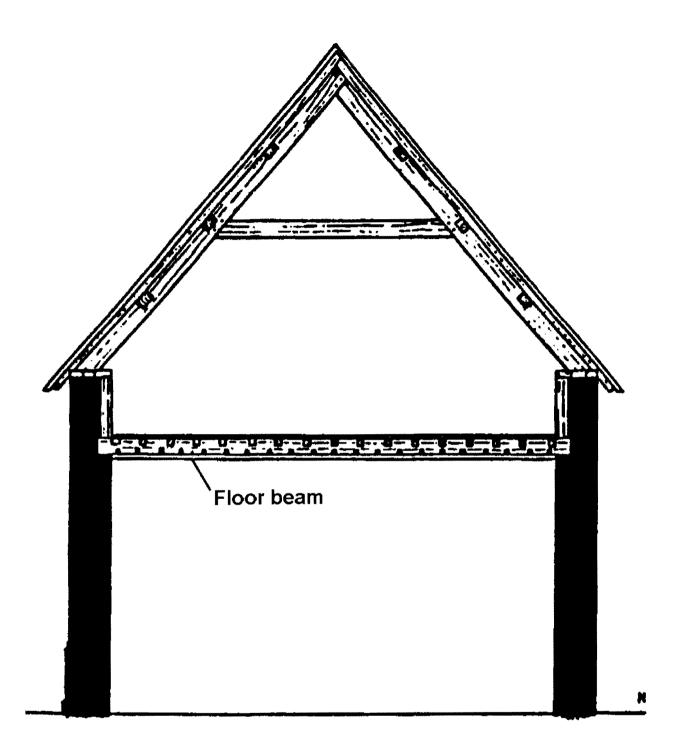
Drawing of the original form of the roof trusses, showing the position of the floor beams, adapted from Rodwell (1991, fig 15)
